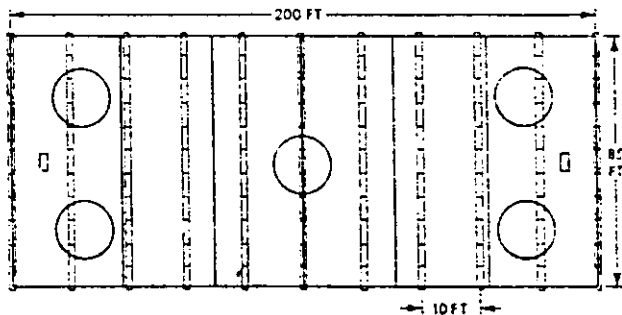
Typical lighting layout of semi-direct fluorescent luminaires on an indoor hockey arena.
